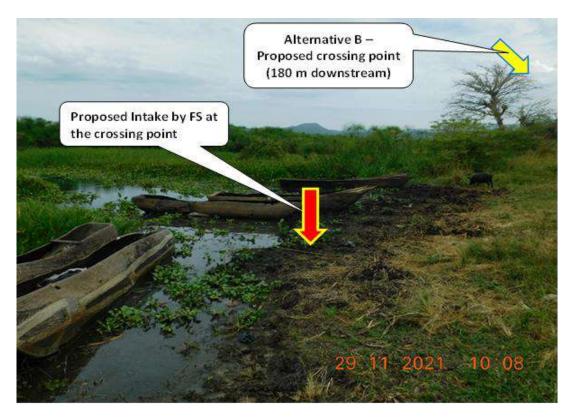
Current landing site and the proposed alternative (new) point about 180m downstream of the intake
